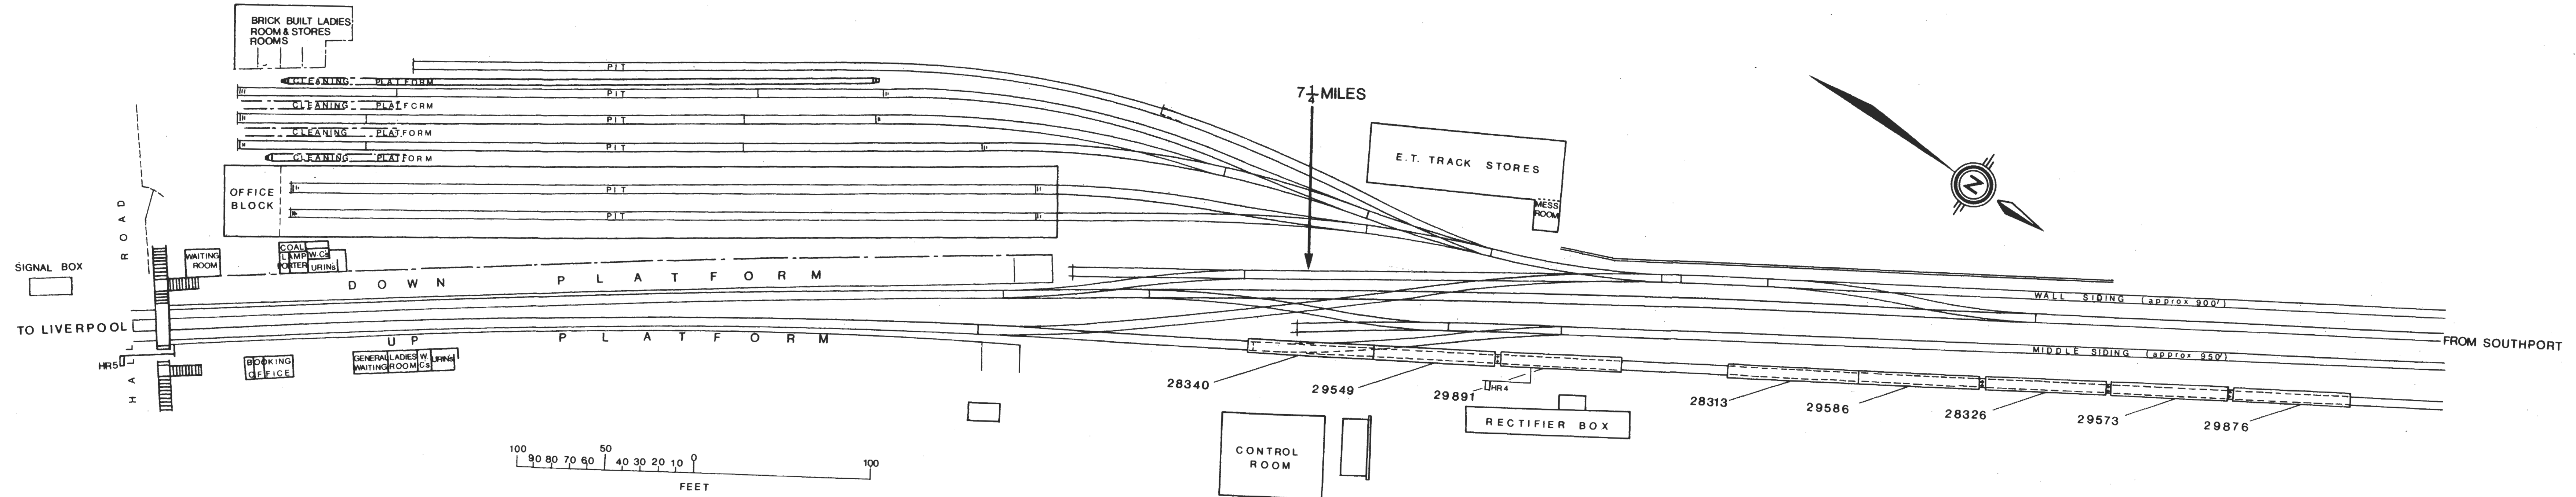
GENERAL PLAN SHOWING SITE OF COLLISION
